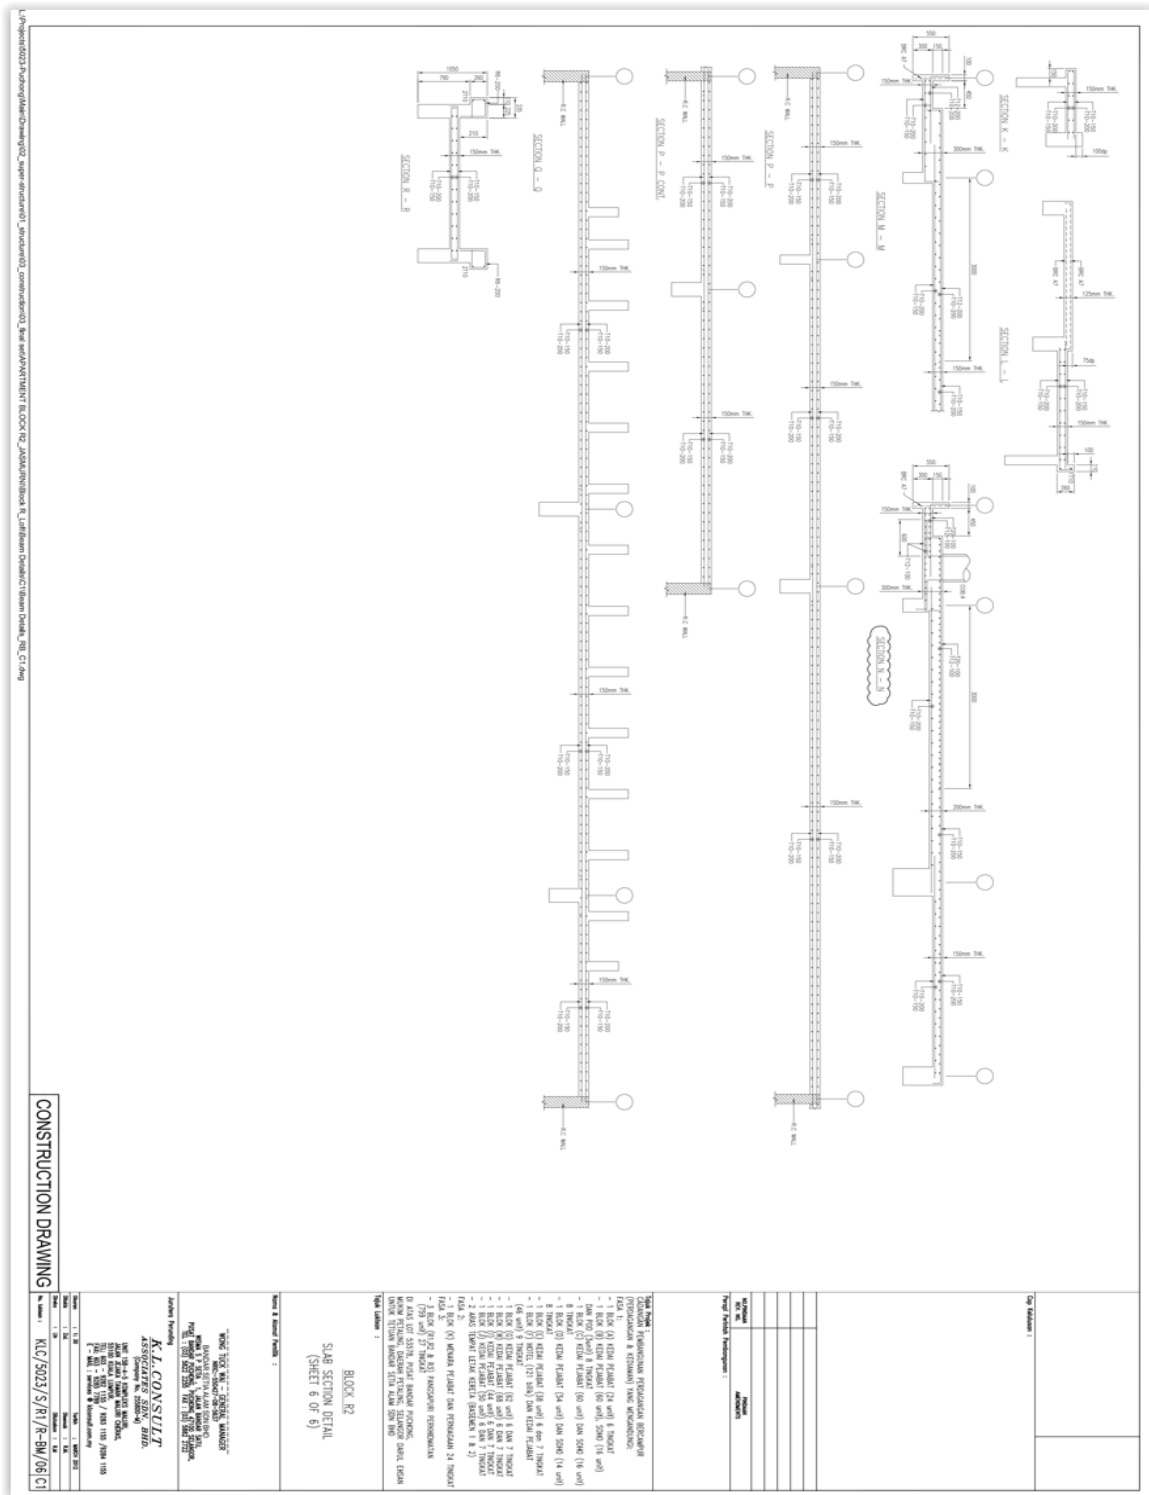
Schematic diagram of reinforcement in concrete flat roof structure used in Malaysia.
